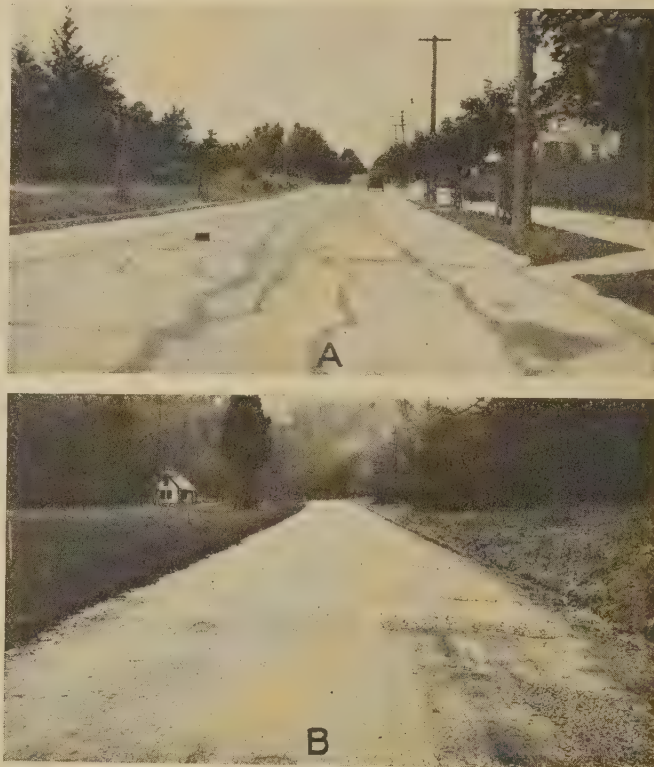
DETRIMENTAL EFFECTS OF ELASTICITY OF SUBGRADE SOIL. A.—TYPE OF CRACKING LIKELY TO OCCUR IN PAVEMENTS LAID ON IMPROPERLY PREPARED ELASTIC SUBGRADES. NOTE CRACKS REFLECTING RUTS IN SUBGRADE. B.—ALLIGATOR HIDE CRACKING IN MACADAM ROAD SURFACE
